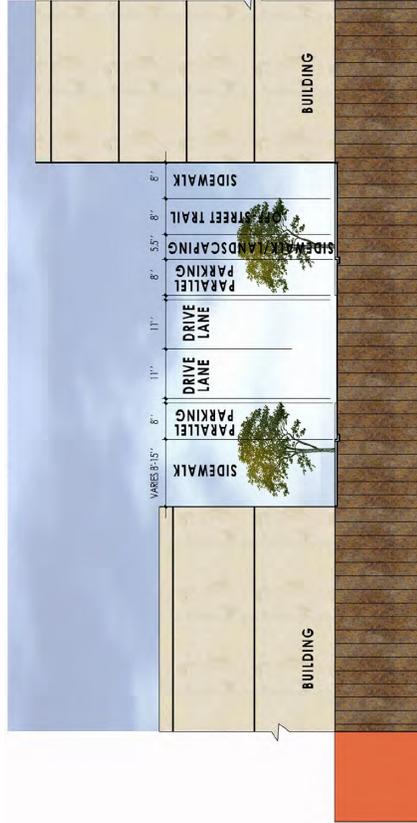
EXHIBIT F: INTERNAL ROAD TYPES (SECTIONS)
